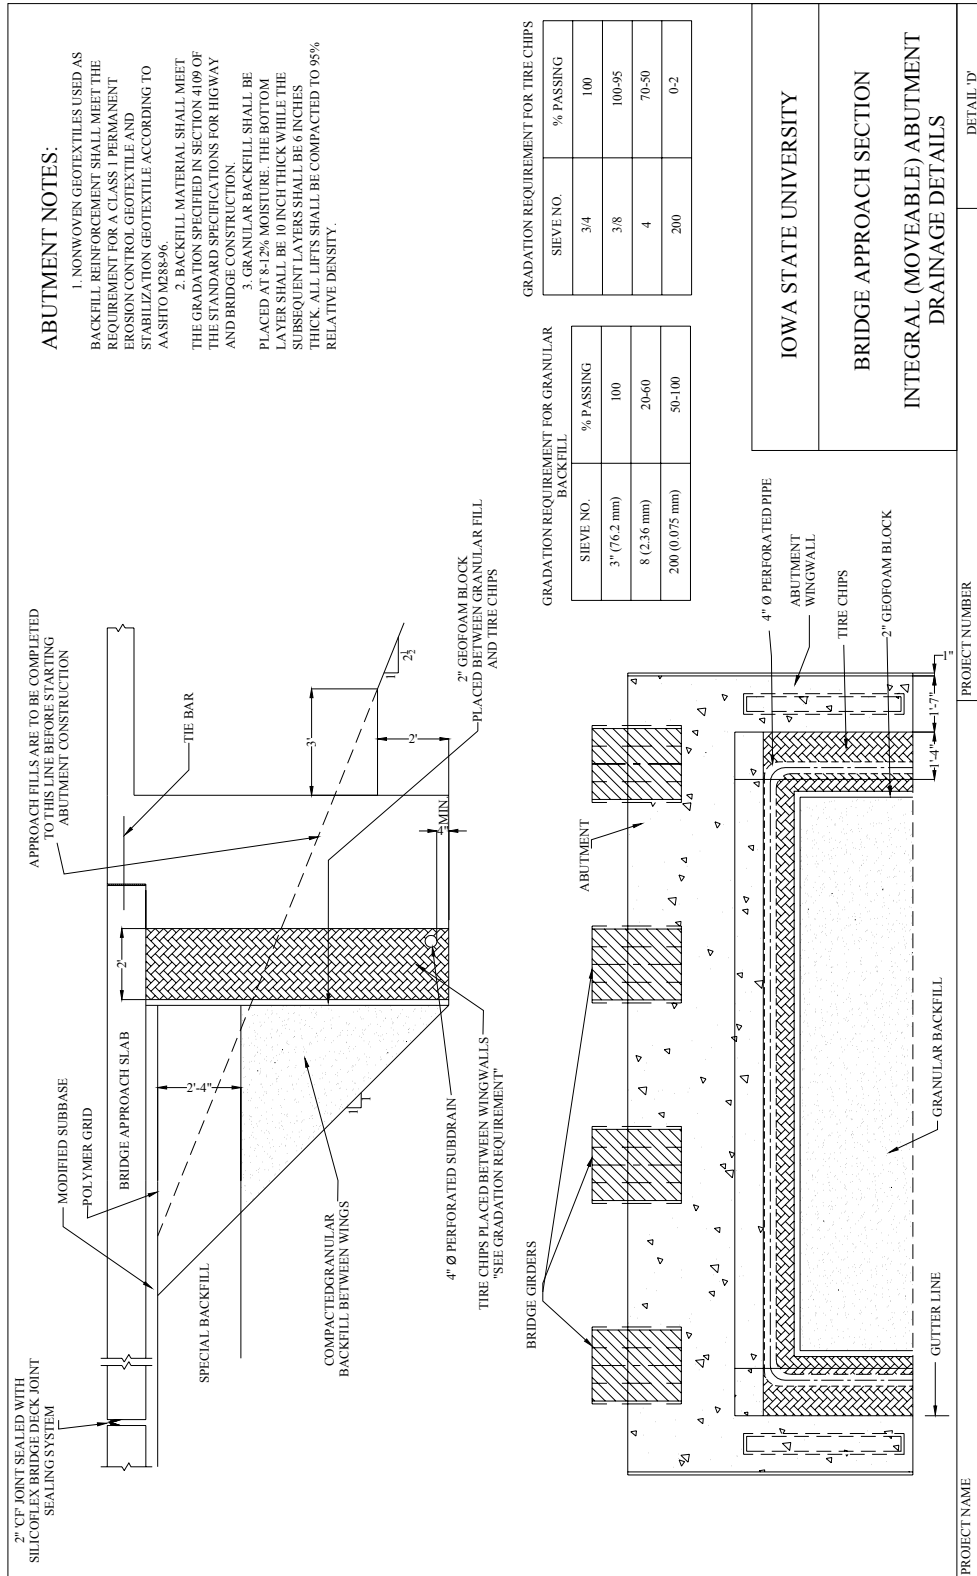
Proposed integral bridge approach drainage detail with tire chip backfill
